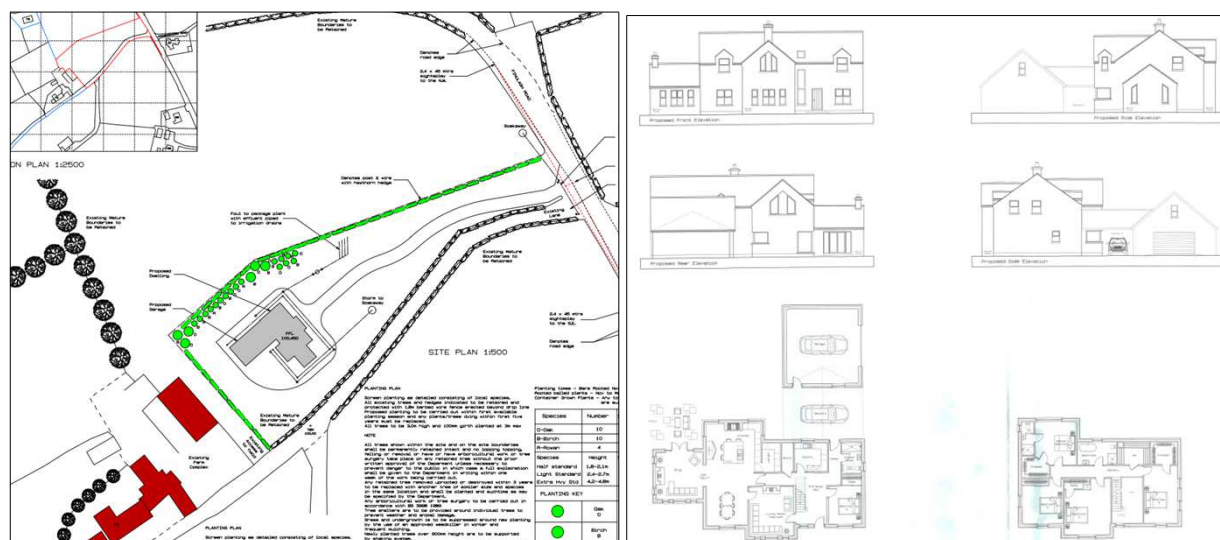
& 6: Proposed site layout; and floor plans and elevations of dwelling including garage, respectively.
